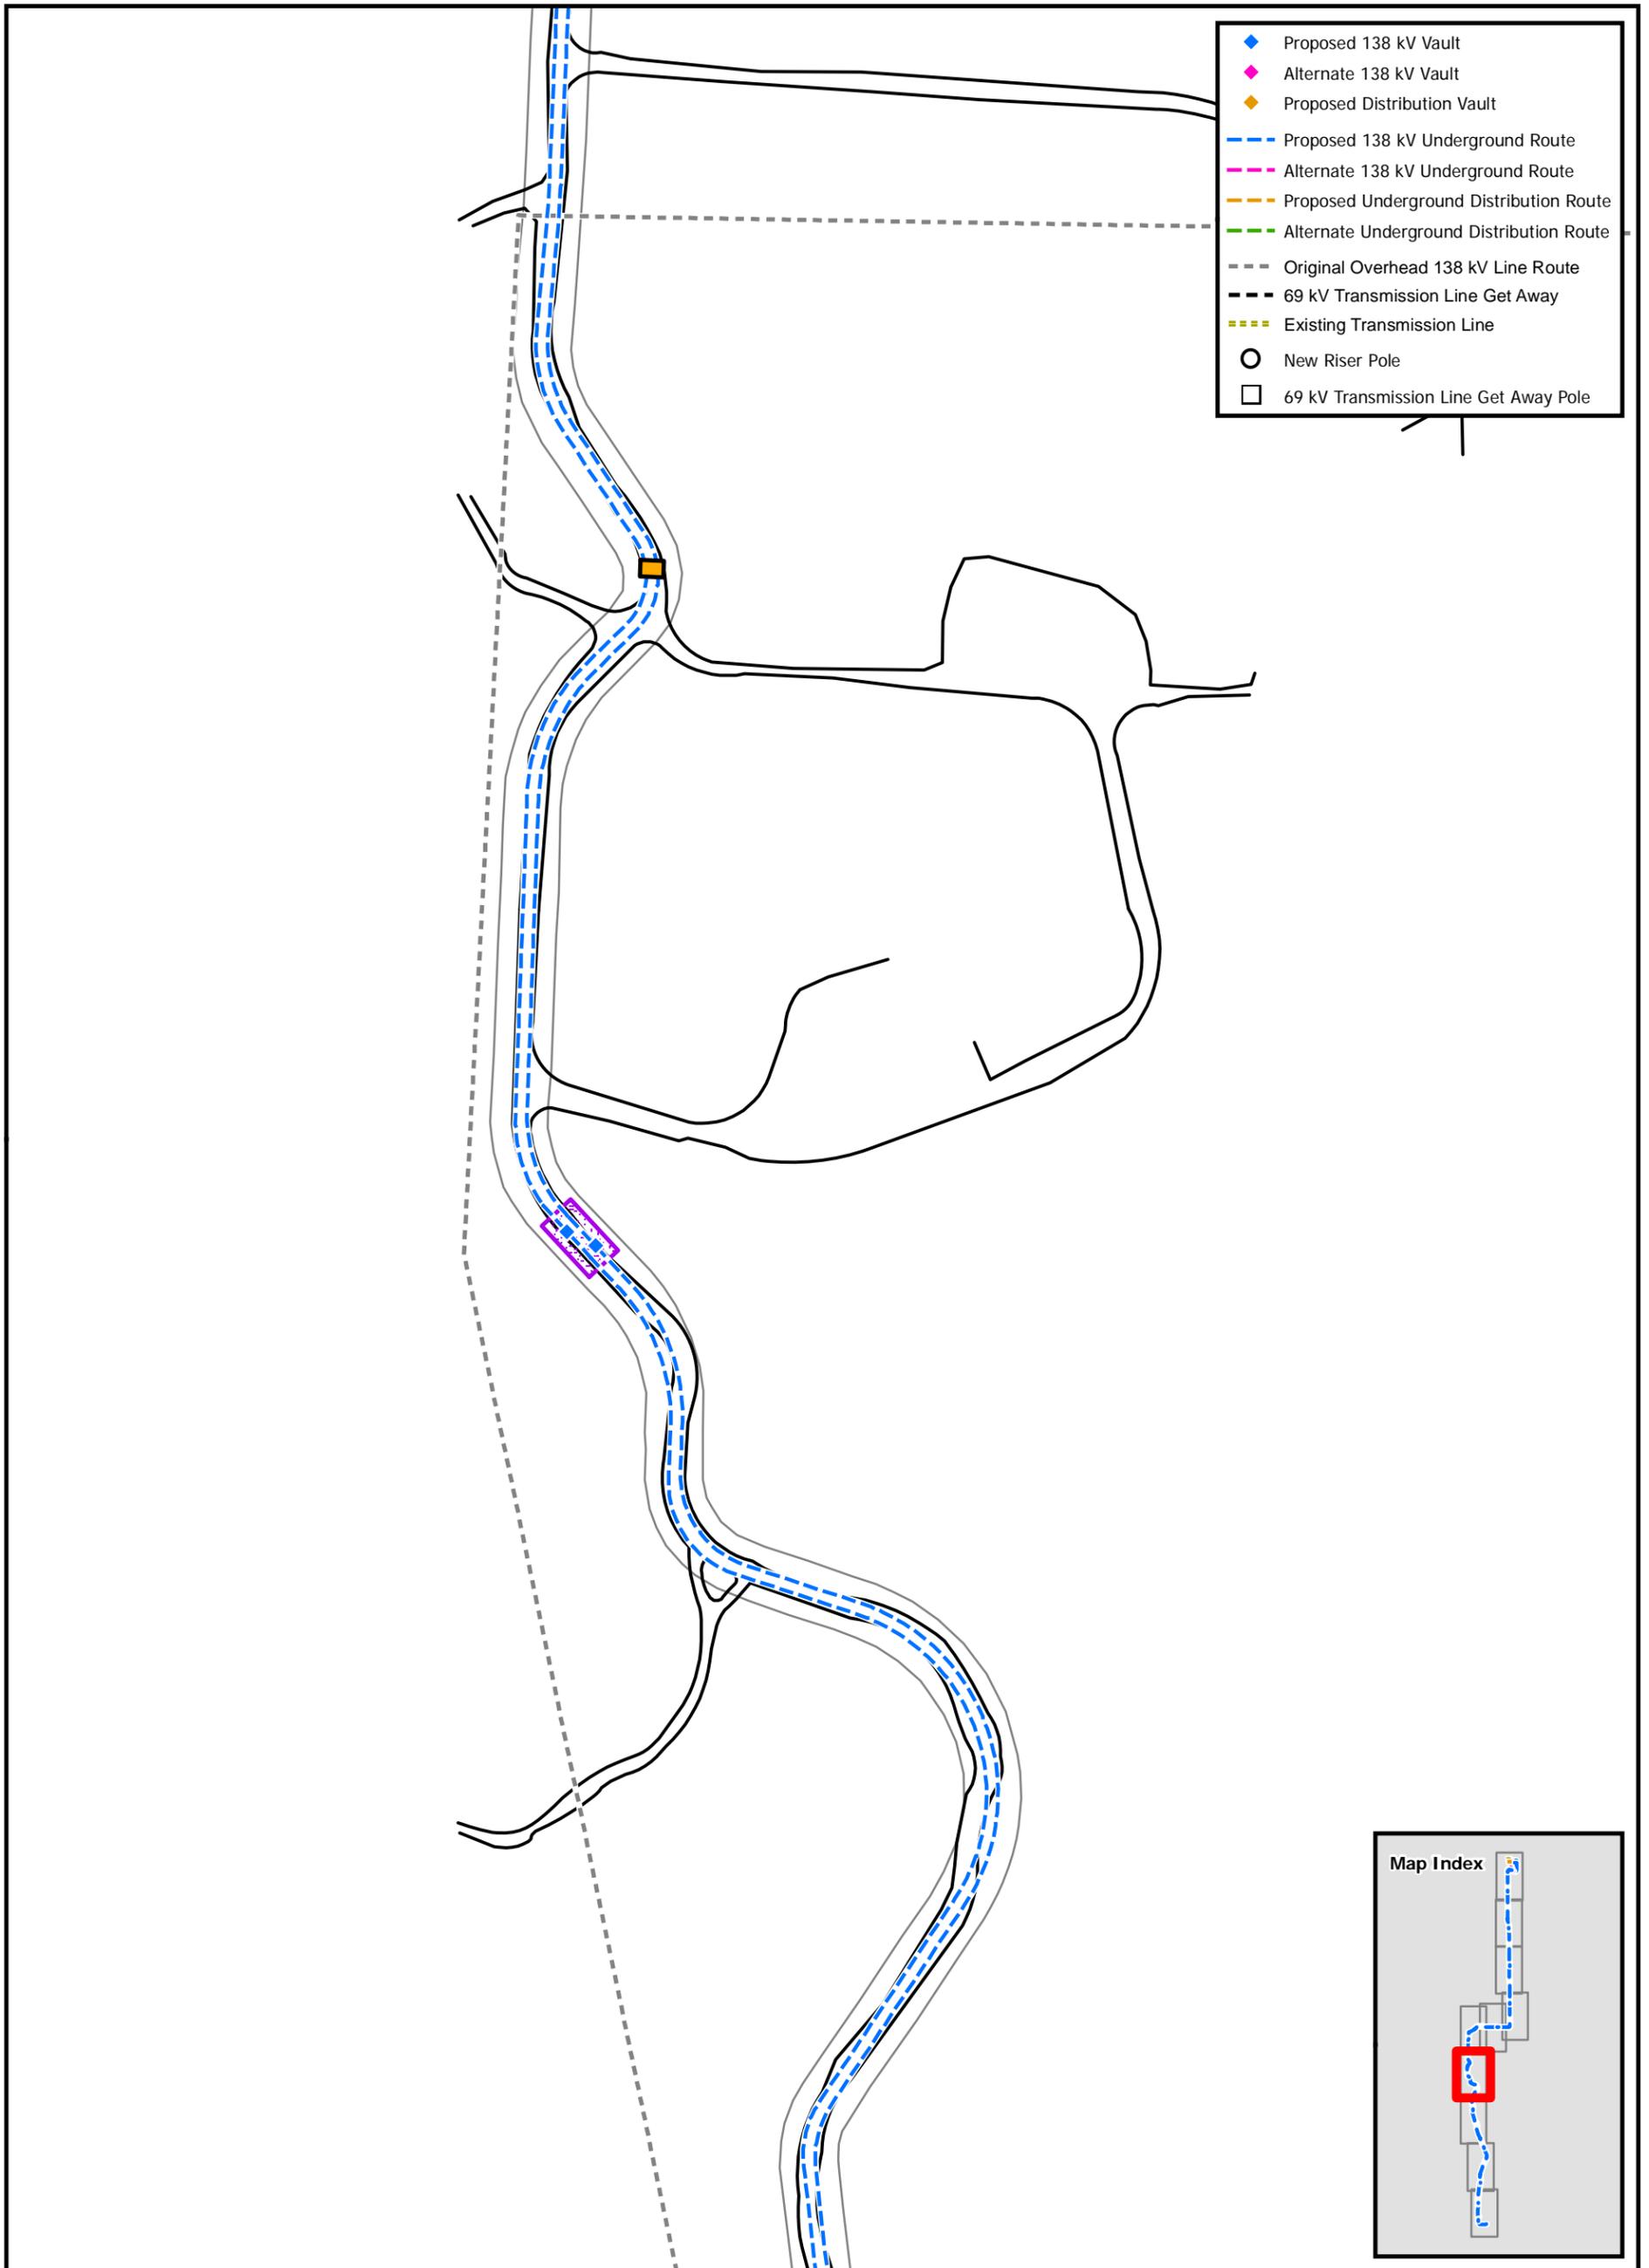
Preliminary Underground Alignment Drawing 7 of 10
